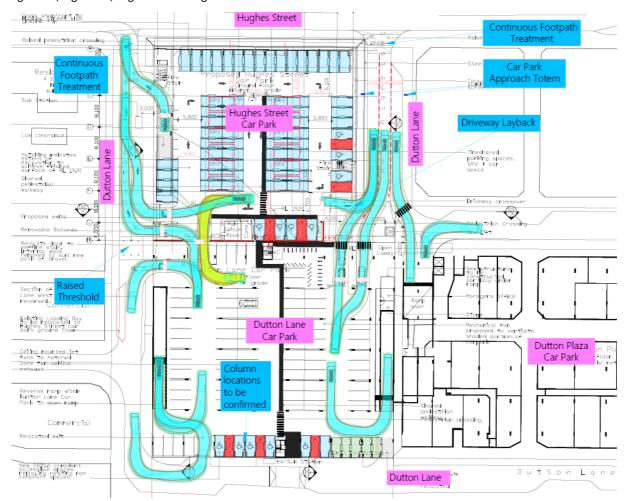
Proposed Car Park Ground Floor Circulation – Cars
